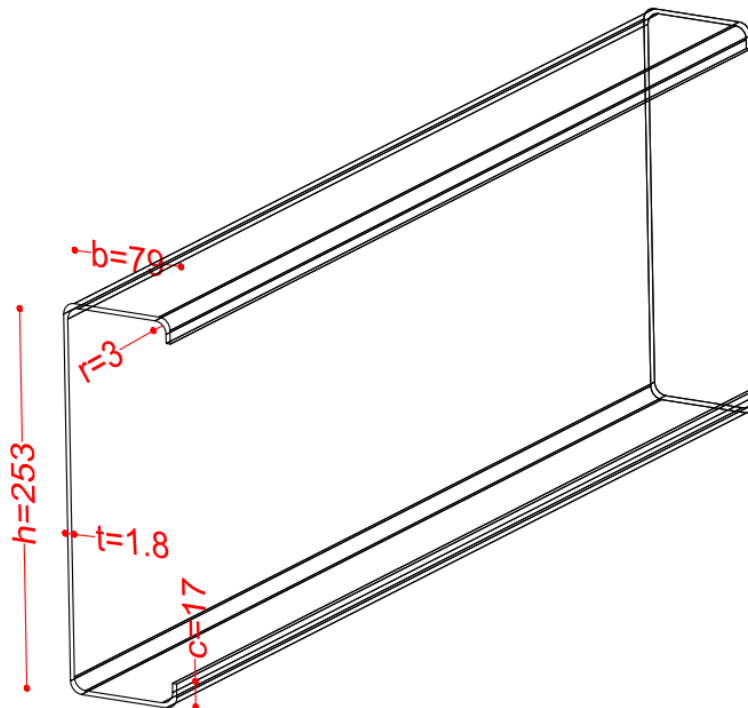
Standard lipped channel section used as a benchmark dimension (mm)
